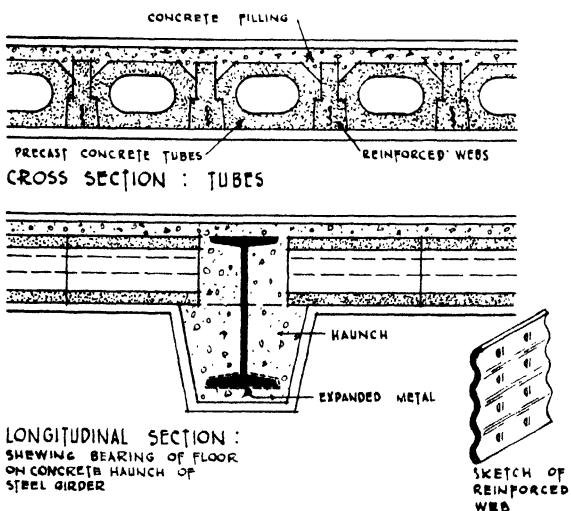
PRECAST CONCRETE FLOOR CONSTRUCTED WITH REINFORCED-CONCRETE WEBS AND HOLLOW COKE-BREEZE CONCRETE TUBES
